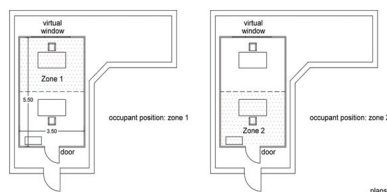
The occupant position as Zone 1 and Zone 2 shown on the plan of the test room.
